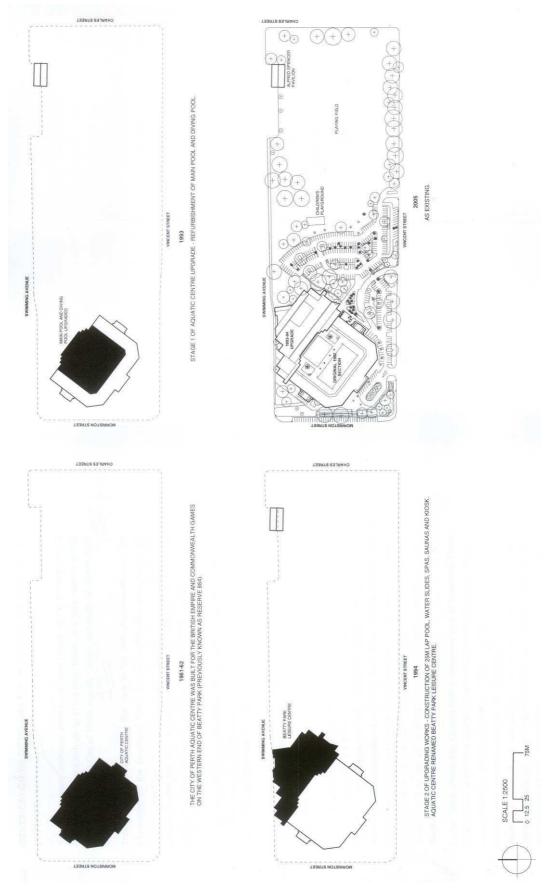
Beatty Park Leisure Centre* – Development Sequence of the Fabric - Site Plan.
